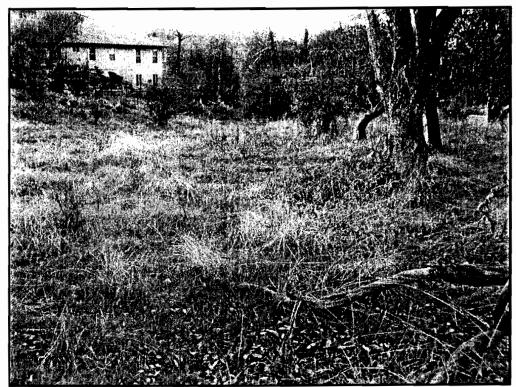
SW1 Looking Downslope at Proposed Fill Area
